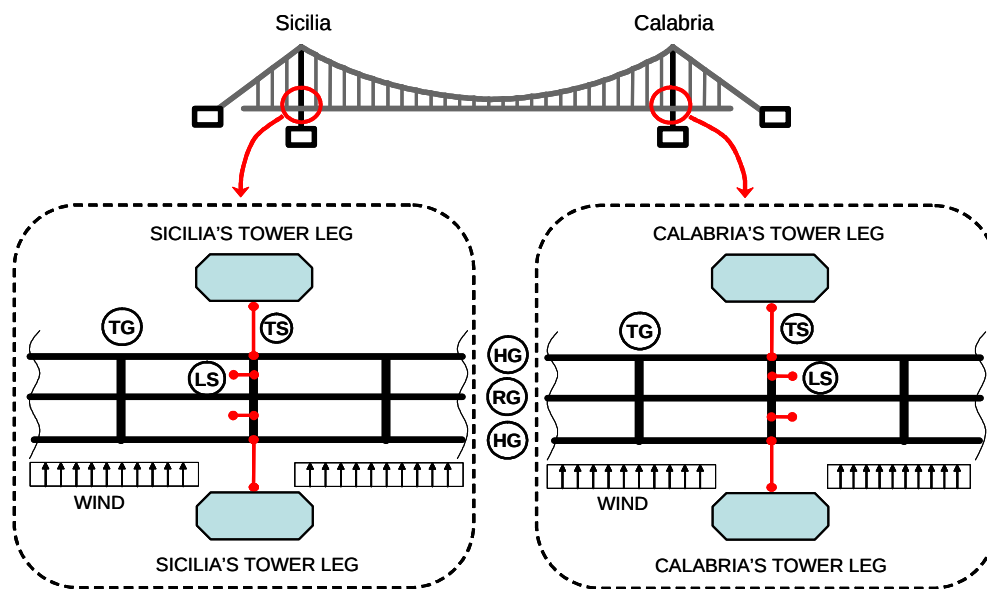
Both transversal slack (TS) and longitudinal slack (LS) arrangement along the suspension bridge. (HG: Highway box girder; RG: Railway box girder; TG: Transverse box girder.)
